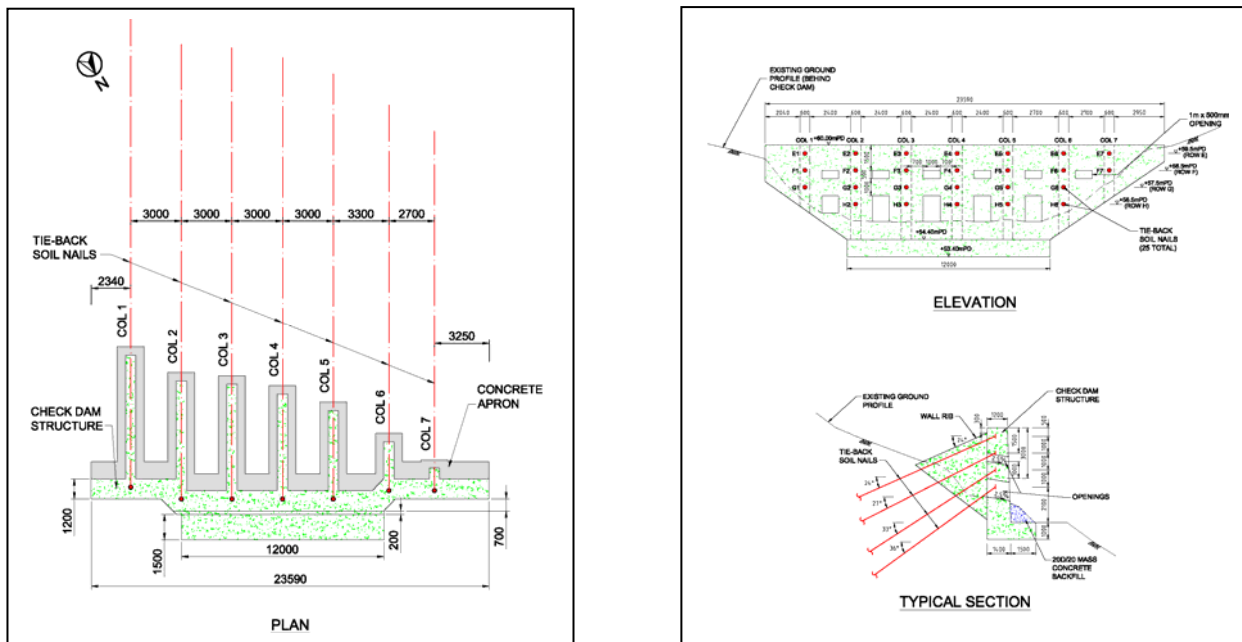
Protective mitigation measures (concrete check dam tied back with 23 – 25m long nails within a stream course)
